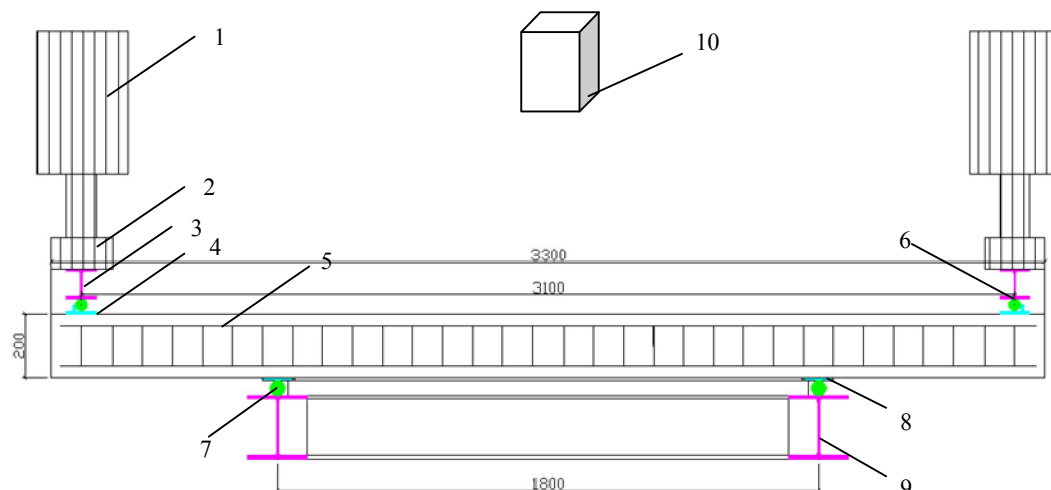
Introduction of test setup. 1. Hydraulic jack; 2. Force sensors; 3. HEB 200 I-steel; 4. Steel plate of 5mm; 5. Test specimen; 6. Steel tube (Diameter: 5mm); 7. Steel tube (Diameter: 5mm); 8. Steel plate of 5mm; 9. I-steel frame (HEB 200); 10. Laserscanner.
